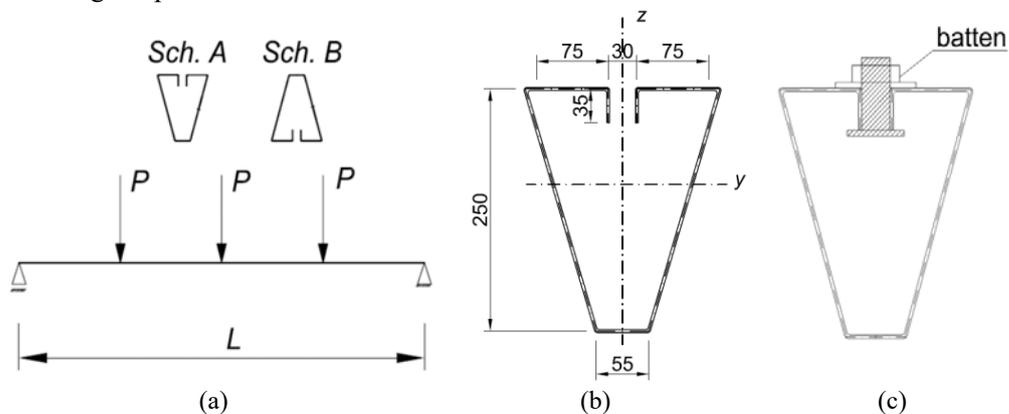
Static model of a profile at bending (a), the cross-sectional details for GEB depth 250 mm (b), the batten invented for the opened GEB cross section
